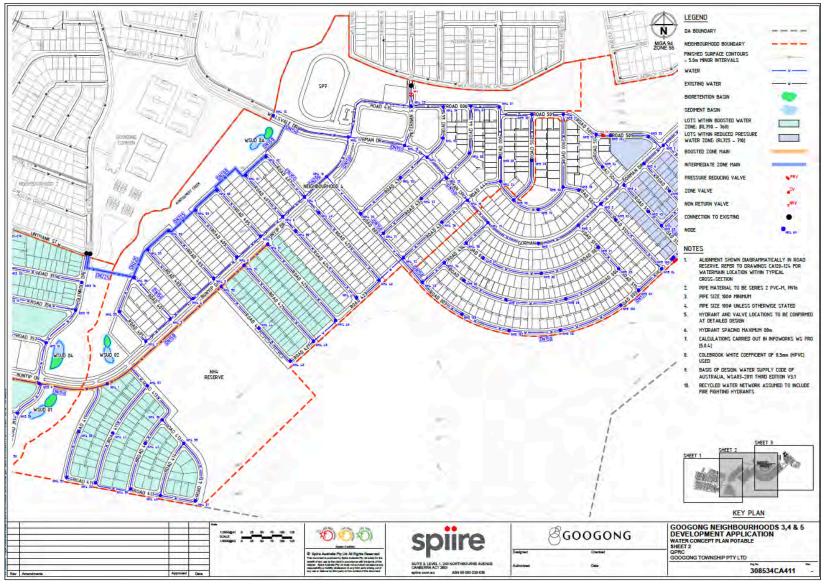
NH 2 Water Concept Plan. (Ember & Spiire, 2021)
